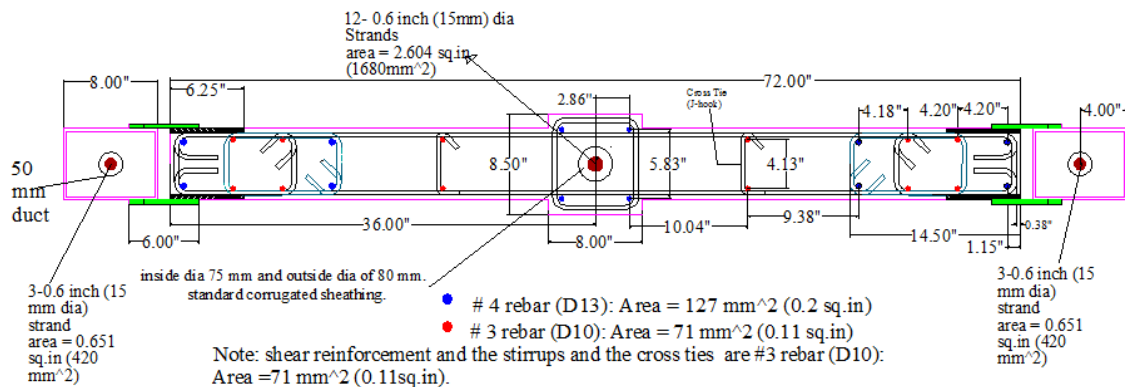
Cross section details of the PreWEC test specimen at the base
